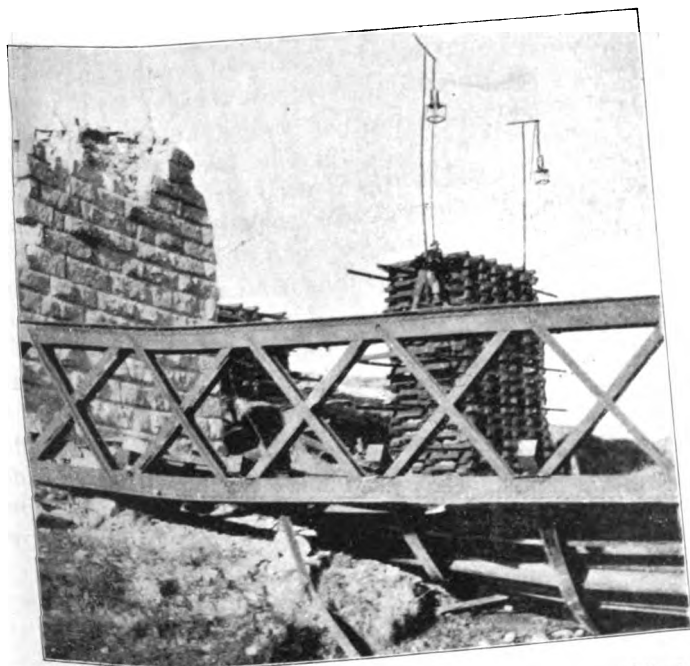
Rhenoster Bridge, showing Girder down, and Arc-lighting.
